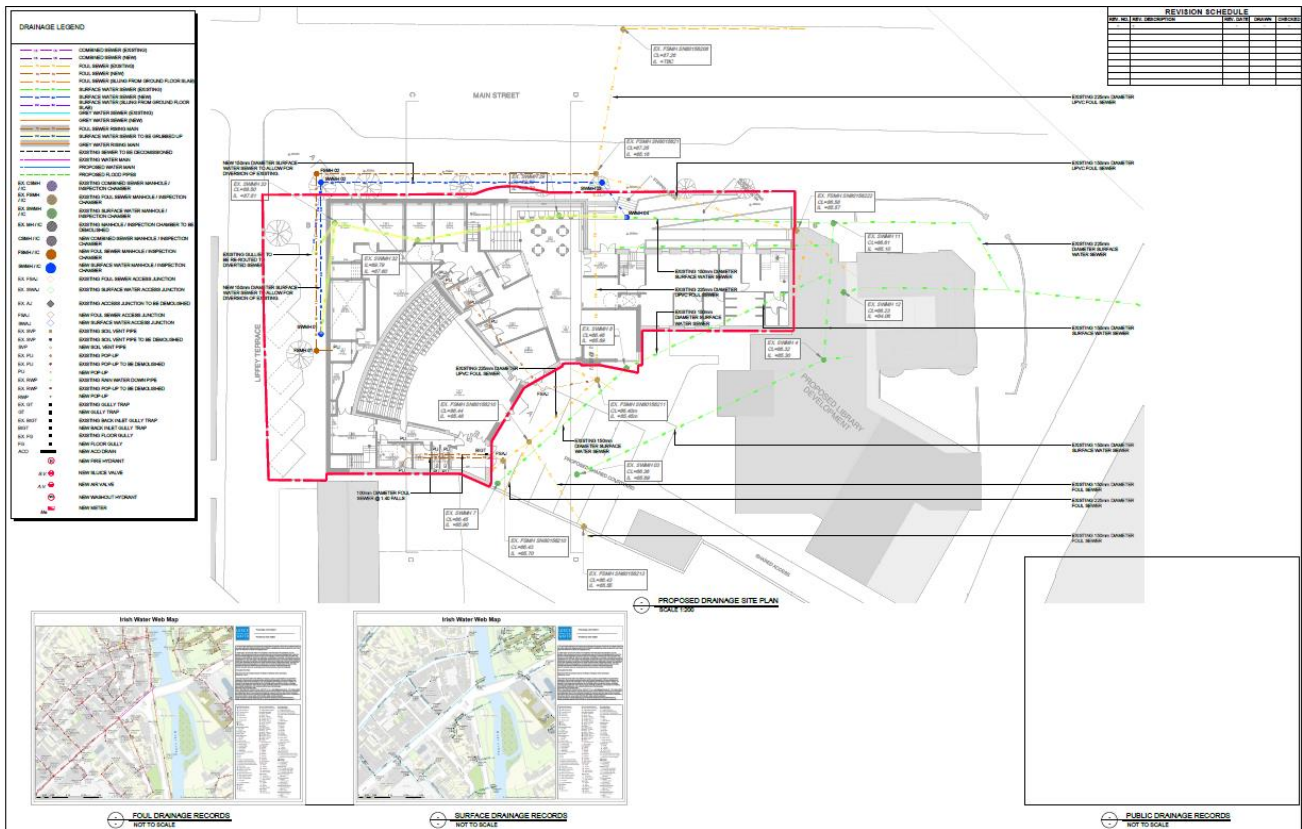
Drainage General Arrangement (Source Cora Consulting Engineers)
